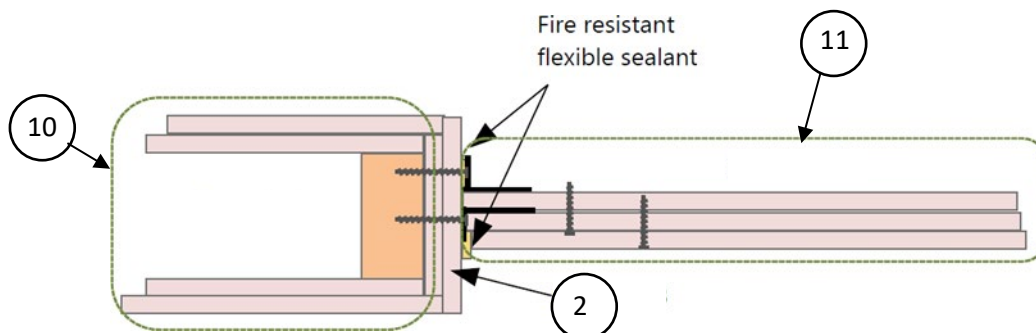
Laminated shaft wall parallel interface with single stud timber partition – Plan view
